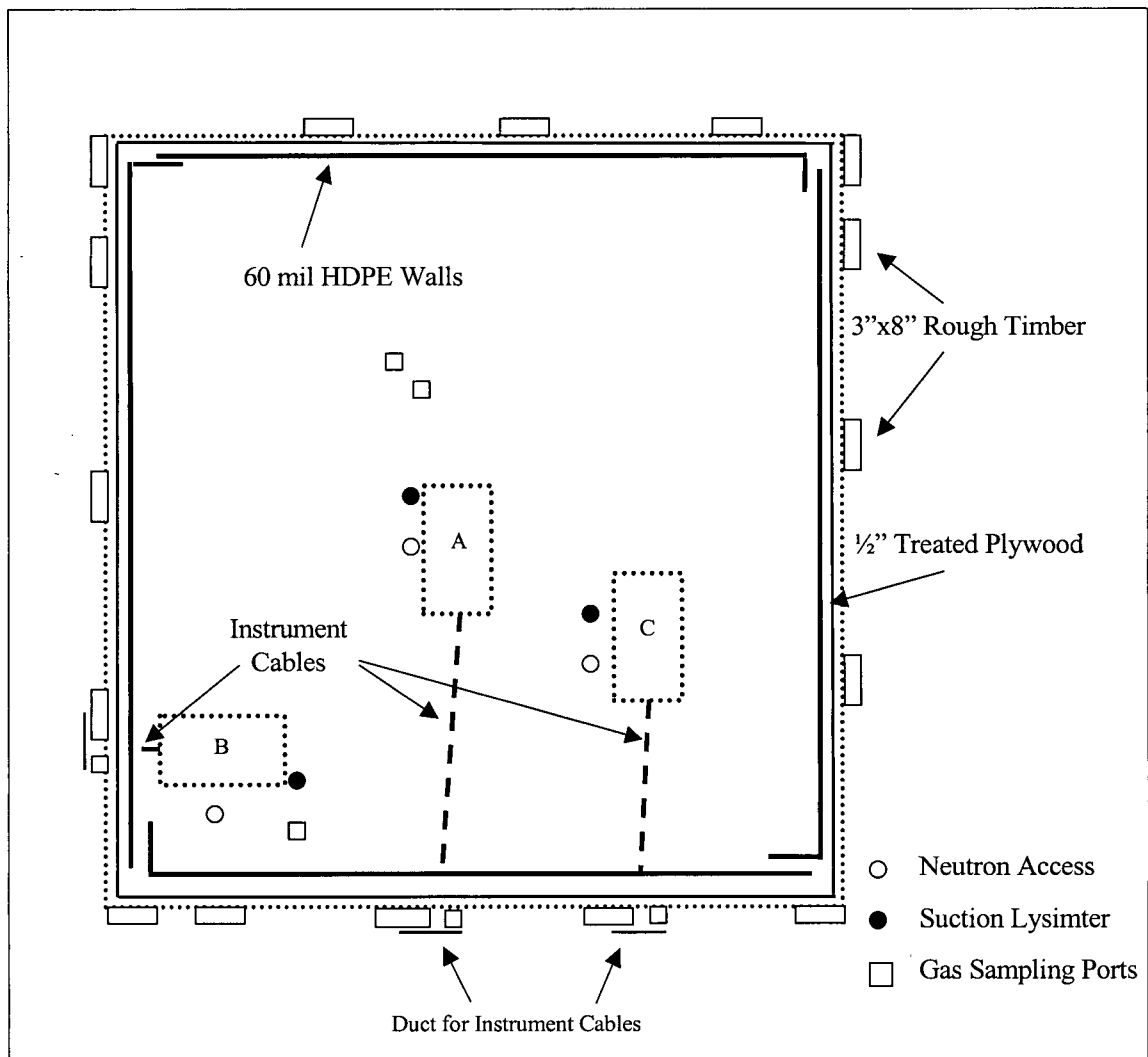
Schematic Plan View of CPE showing Instrument Profile Locations
